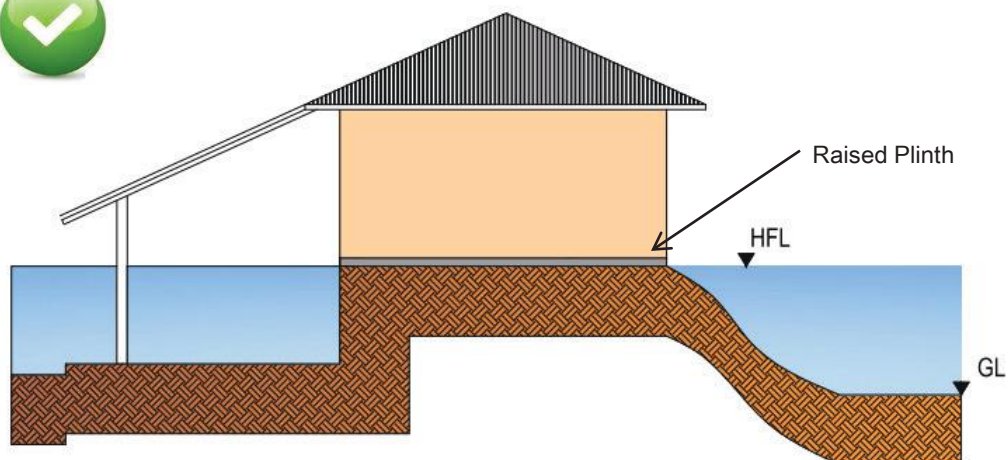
Plinth Level Raised By Creating An Elevated Ground
